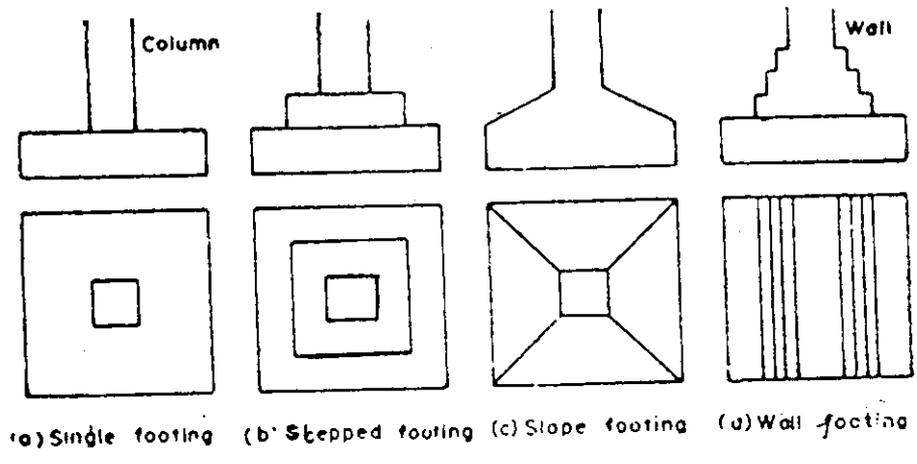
TYPES OF SPREAD FOOTINGS
